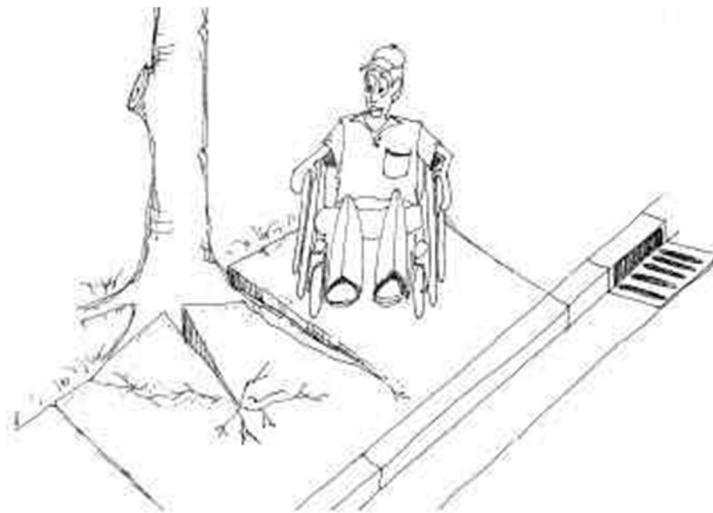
Trees obstructing the clear walking space, hence the need for a planting zone and a planting plan for streets.
